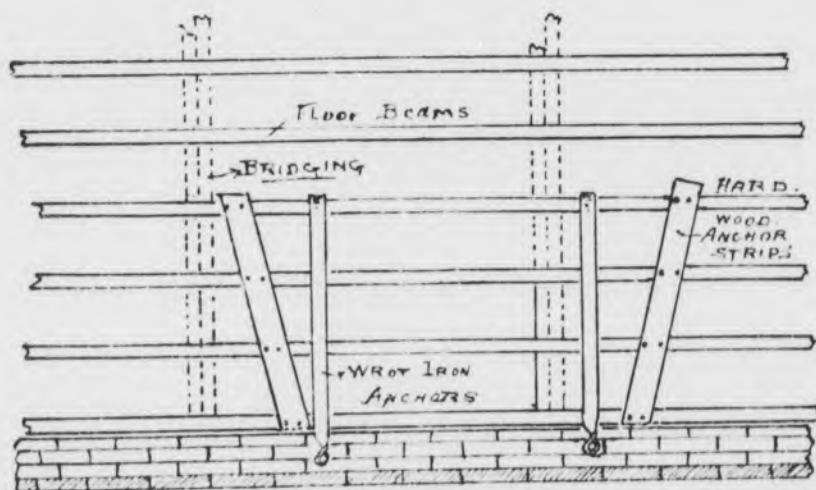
PLAN OF FLOORS SHOWING METHOD OF ANCHORING FRONT AND REAR WALLS TO BEAMS.
